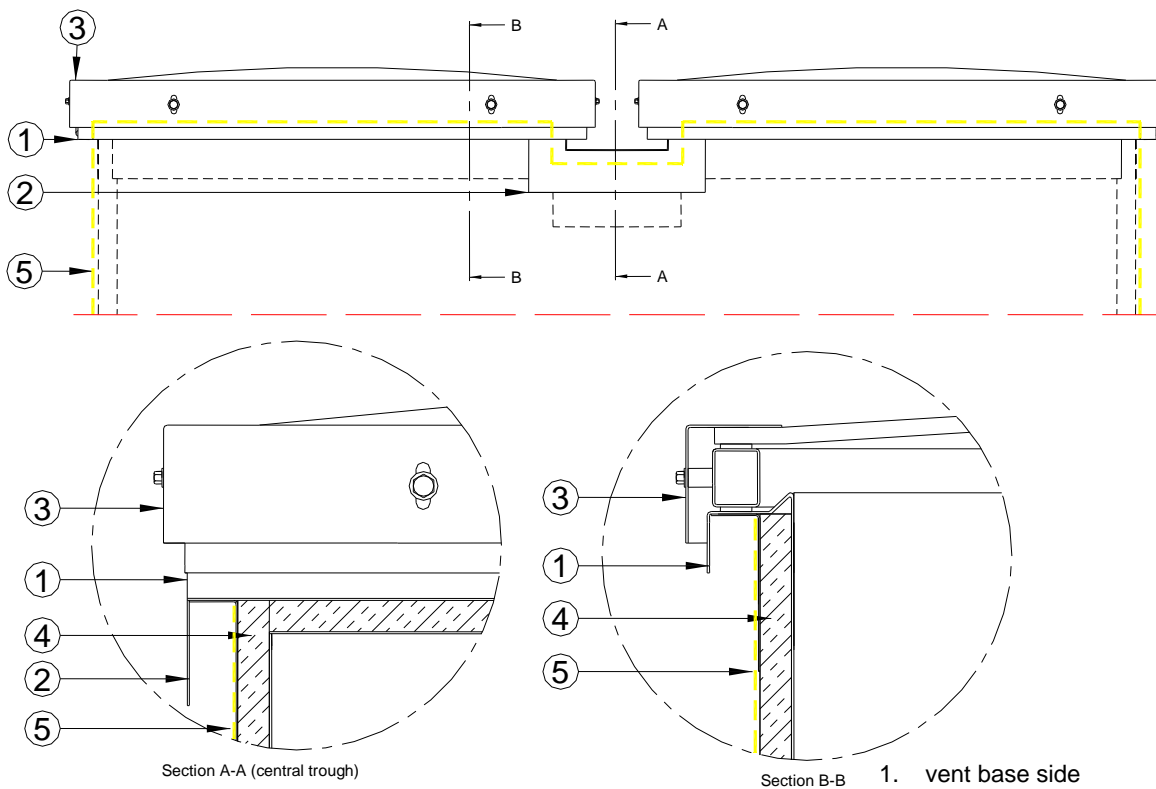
Diagram of water insulation installation on mcr-PROLIGHT vent
